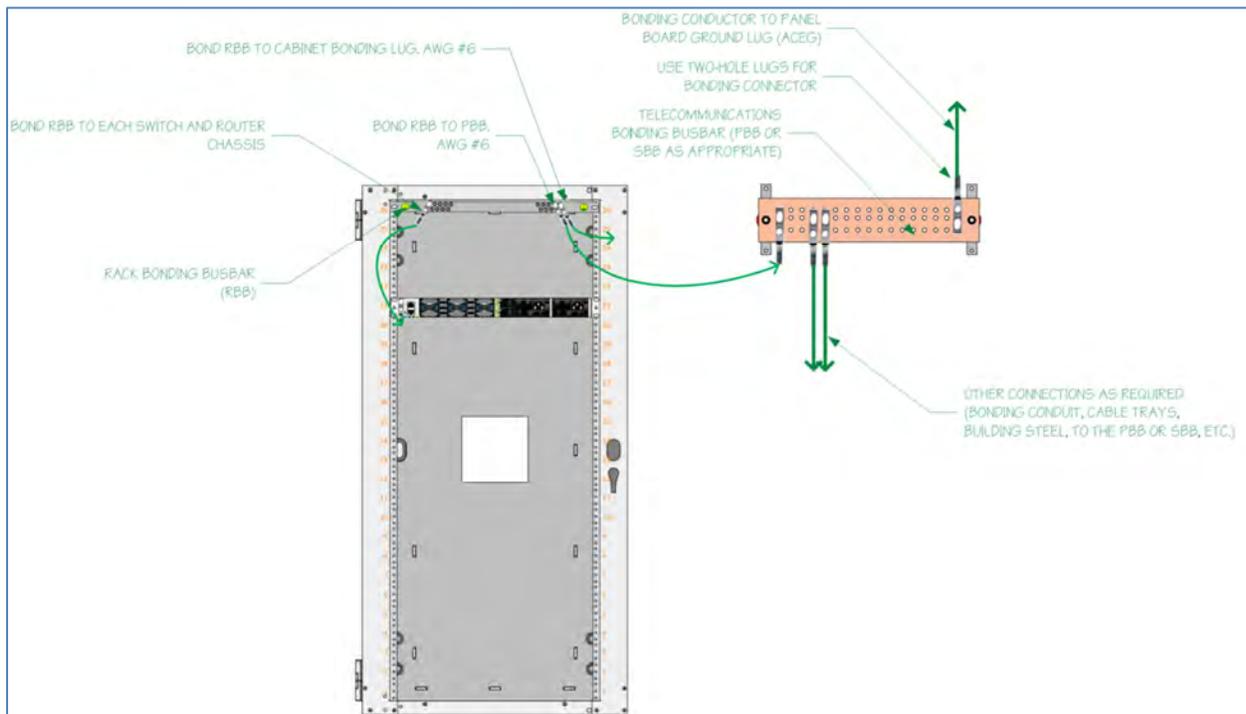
TE Grounding Elevation (OIT Design Guide Template)
